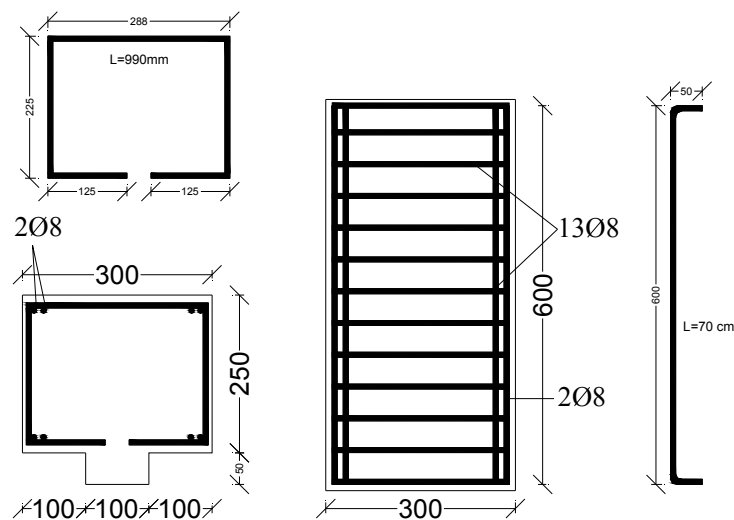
Reinforcement layout and geometry of specimen 1 (Specimen code 3.1 - loading at 1/4 of the length).
